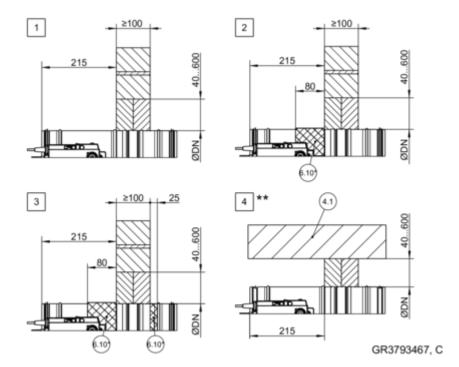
Dry mortarless installation with fire batt into a solid wall
